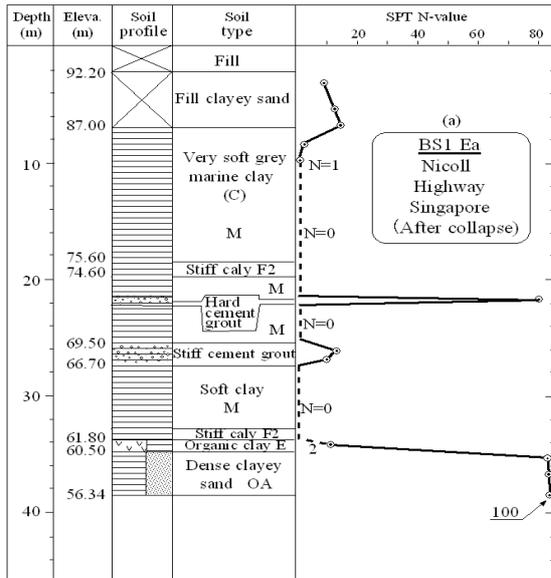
Soil profiles just south of the collapsed diaphragm wall panels 8
